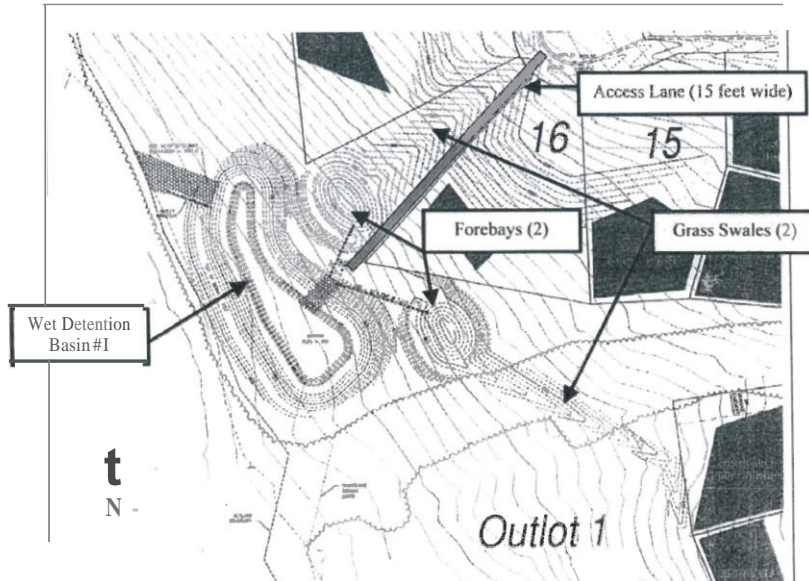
Exhibit C • Stormwater Practice Maintenance Plan (Sample)
